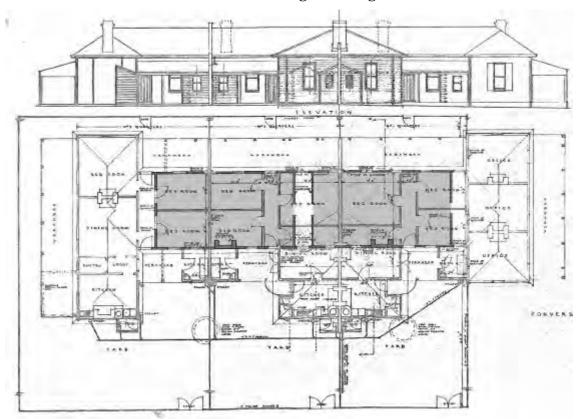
Plan of MH27 showing original works to convert it into 3 married quarters and rear elevation. The shading has been added to the plan to show the original configuration.
